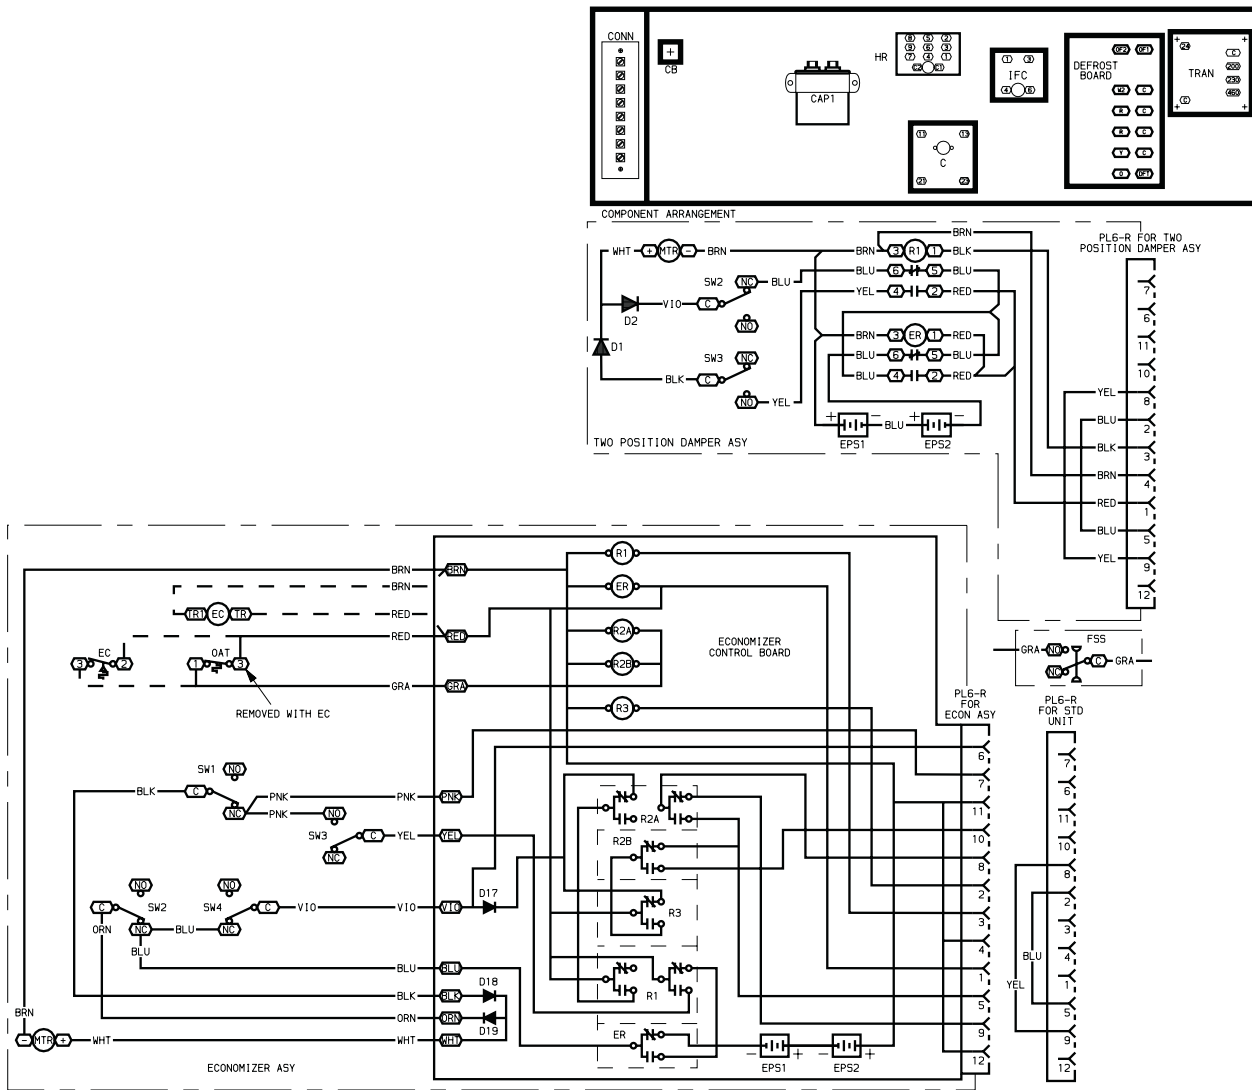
Schematic/Component Arrangement; 50TFQ004,005; 575-3-60
